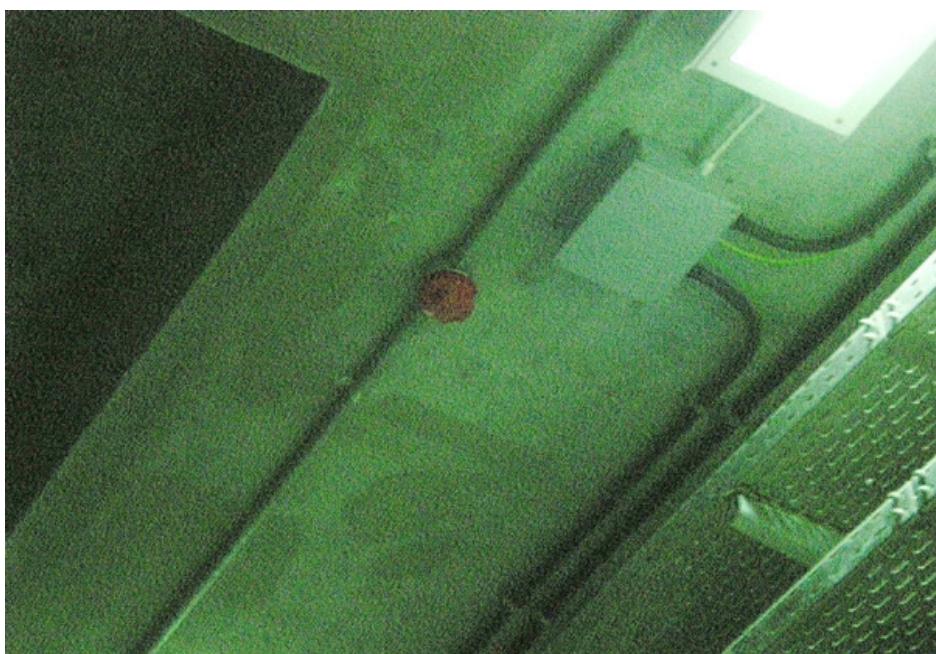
Example of utility tunnel fire detection/sprinkler system
